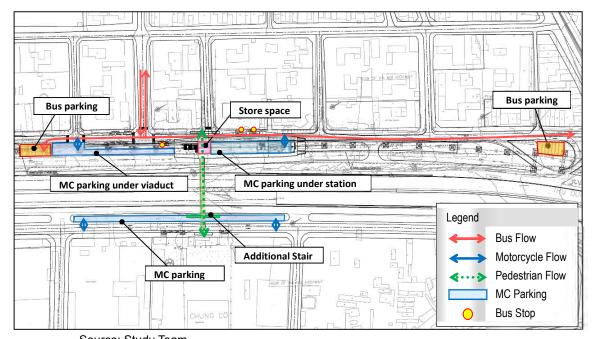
Concept Plan of Thu Duc Station Area (upon UMRT opening)
